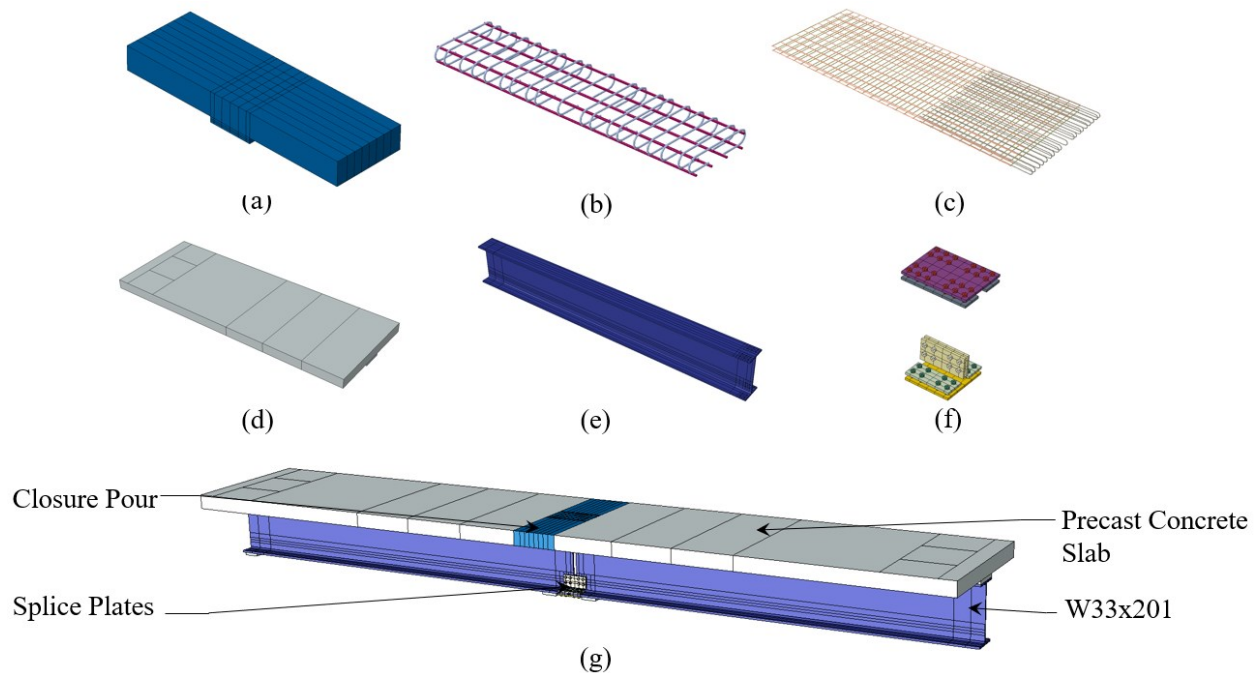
(a) Concrete Closure Pour, (b) Rebar in Closure Pour, (c) Rebar in Precast Concrete Slab, (d) Precast Concrete Slab, (e) Steel Girder, (f) Splice Plates with Bolts, and (g) Model Assembly.
